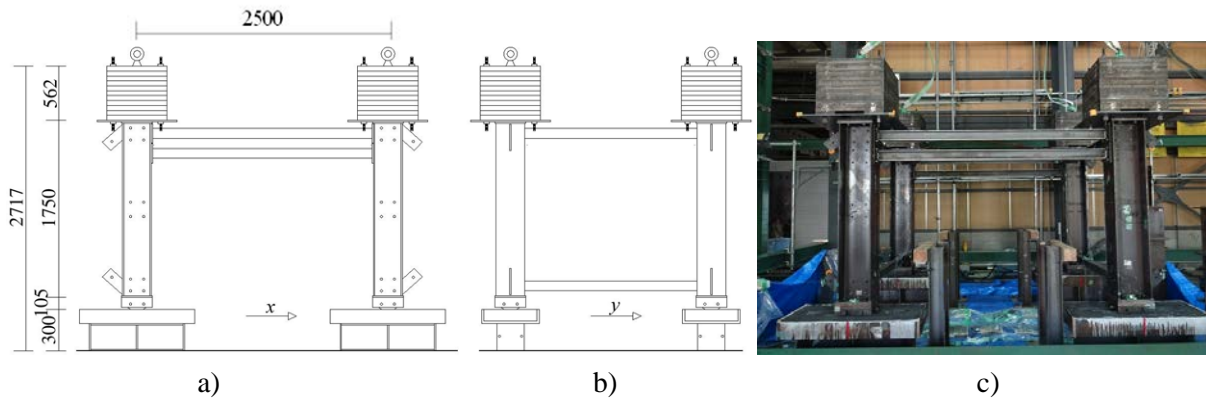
Test specimen: (a, b) details of the specimen; (c) test set up
